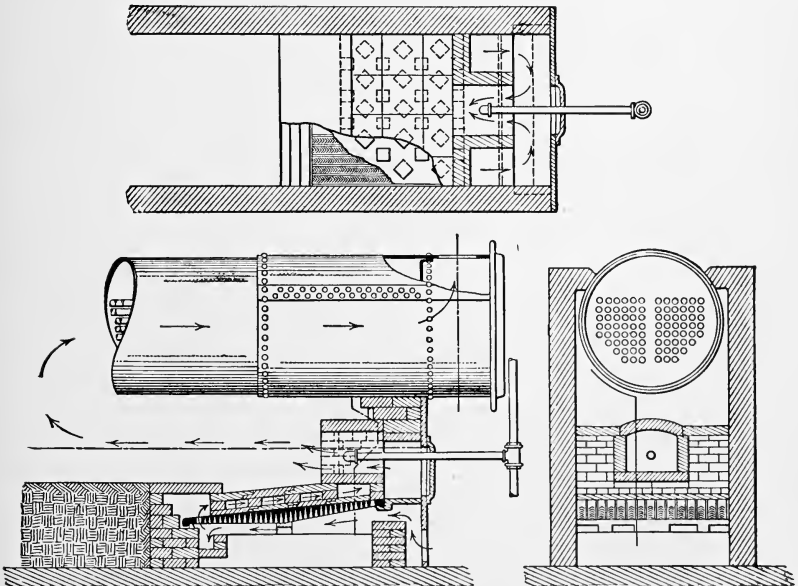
Modern Furnace for Burning Fuel Oil, Front Feed.
